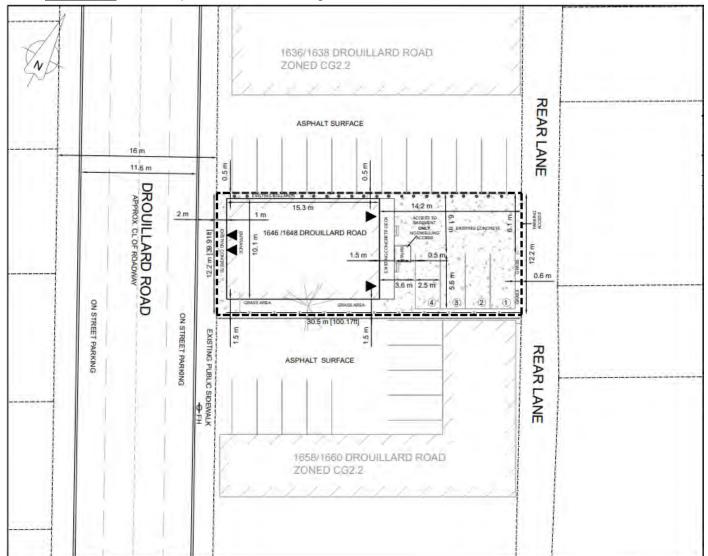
Concept Site Plan Drawing (Urban in Mind)
